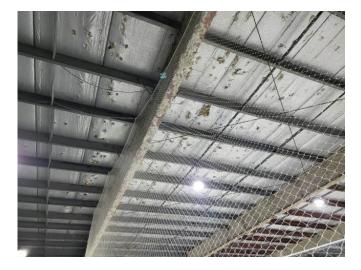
Damaged Roofing Backpacked Insulation - Red Arena
